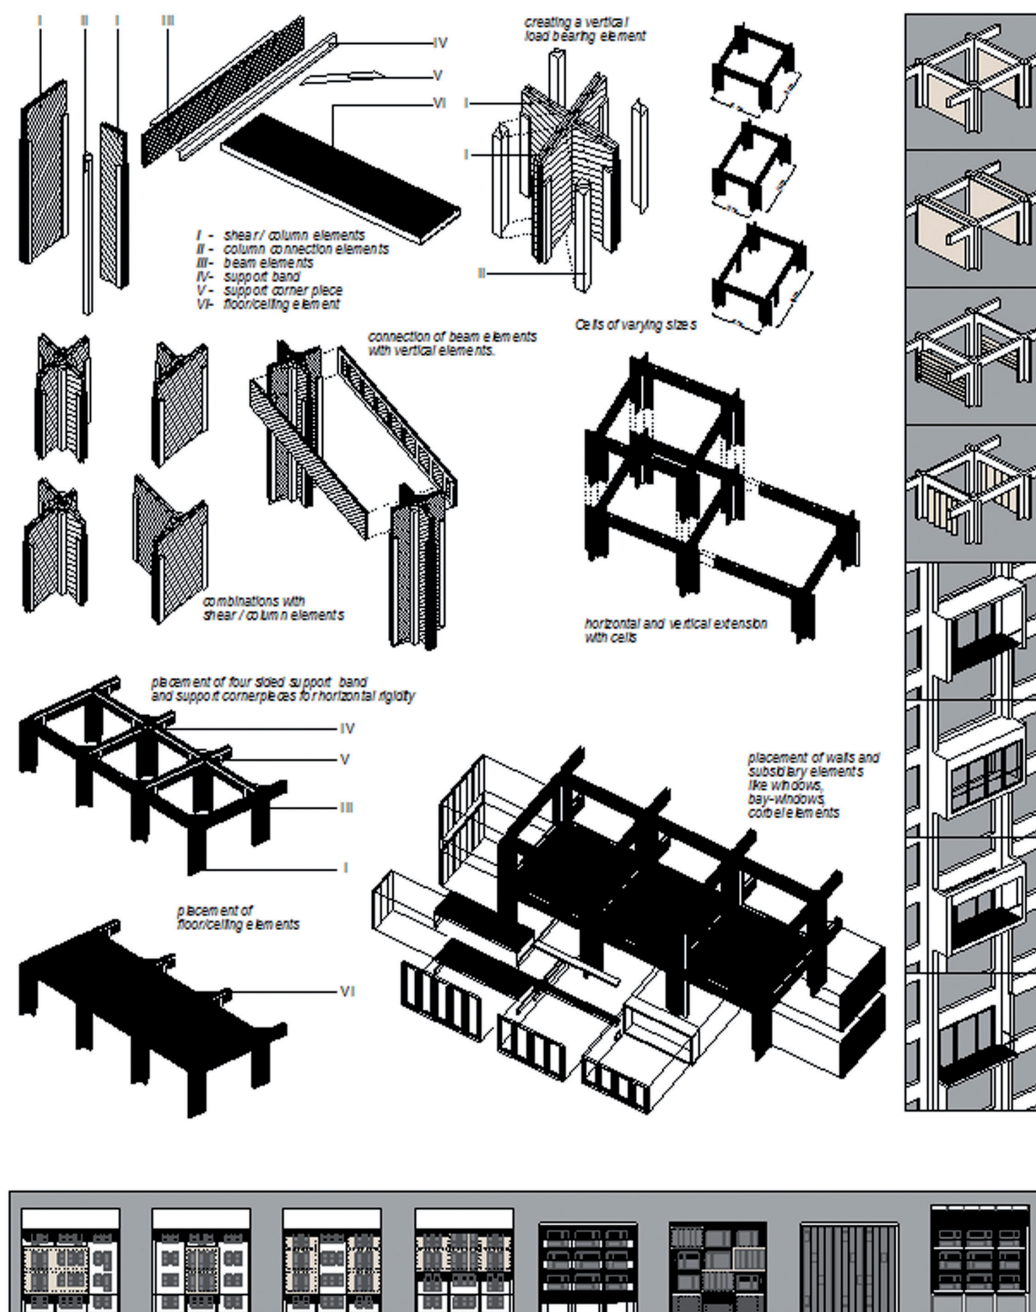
Unit construction system, elasticity for arrangement and variations for planners; possibilities for separating the rooms and façade arrangements (Somer 2008).
